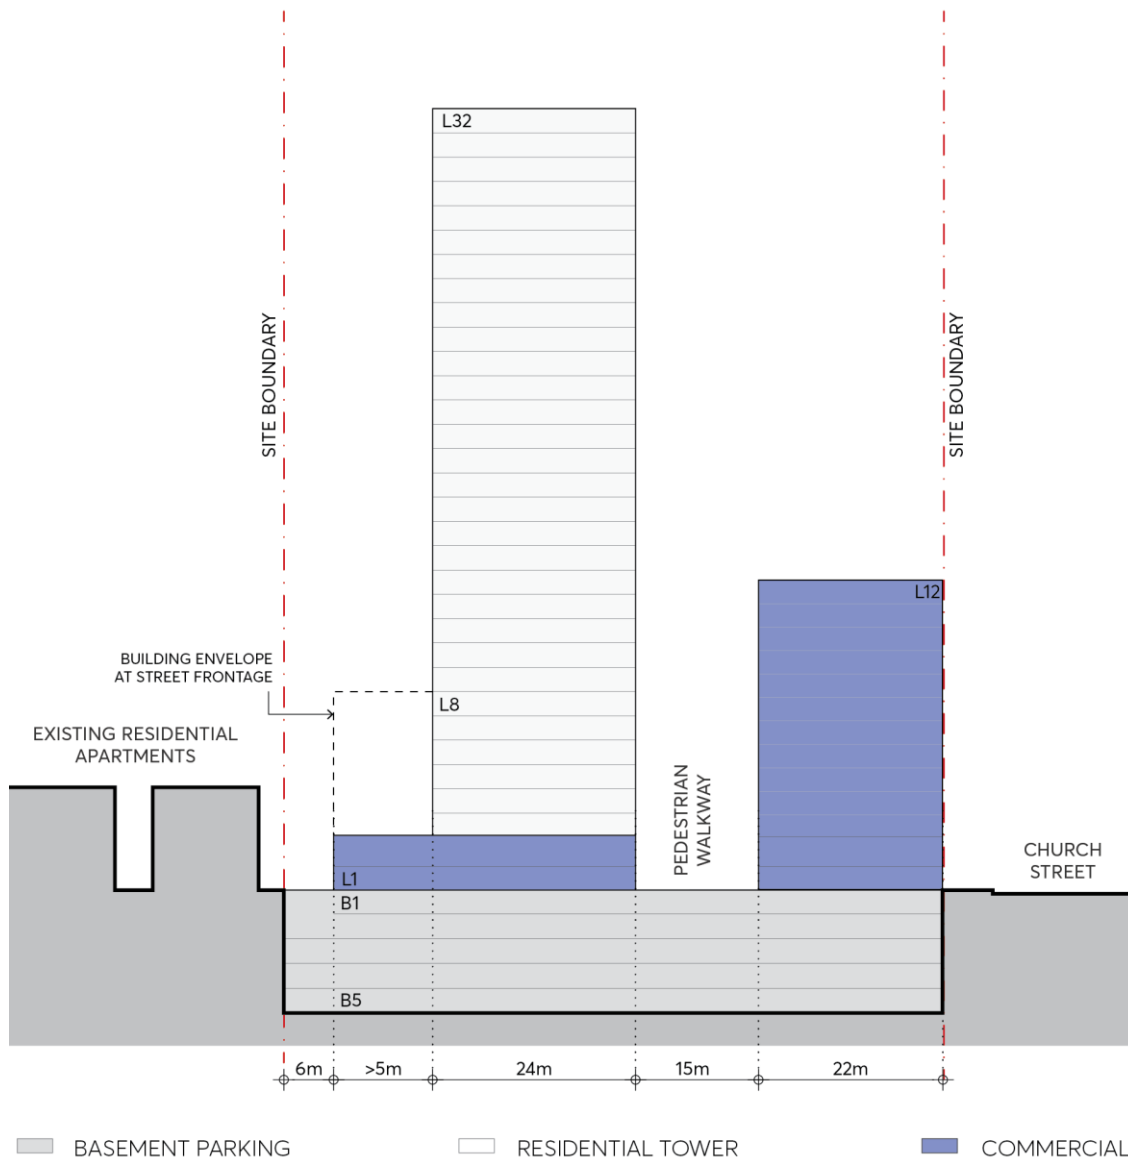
Building Form Control Section (Northern Side)
